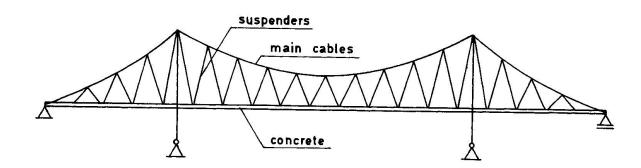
Outline of a prestressed concrete suspension bridge with a triangular system of suspenders
